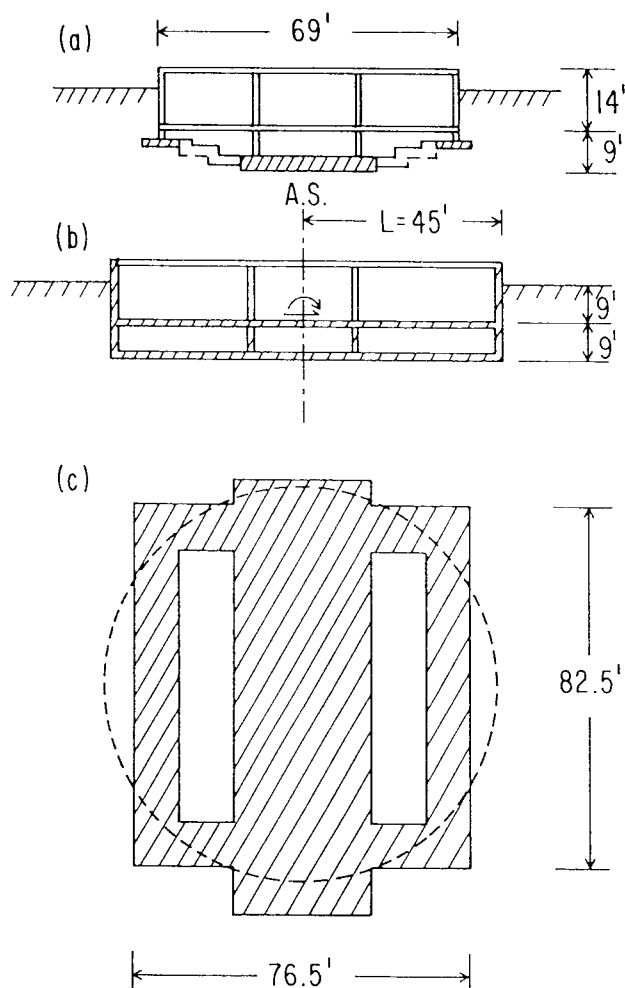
Foundation system of the Millikan Library Building. (a) NS section of actual foundation, (b) section of model for EW vibrations, and (c) plan view of foundation and model
